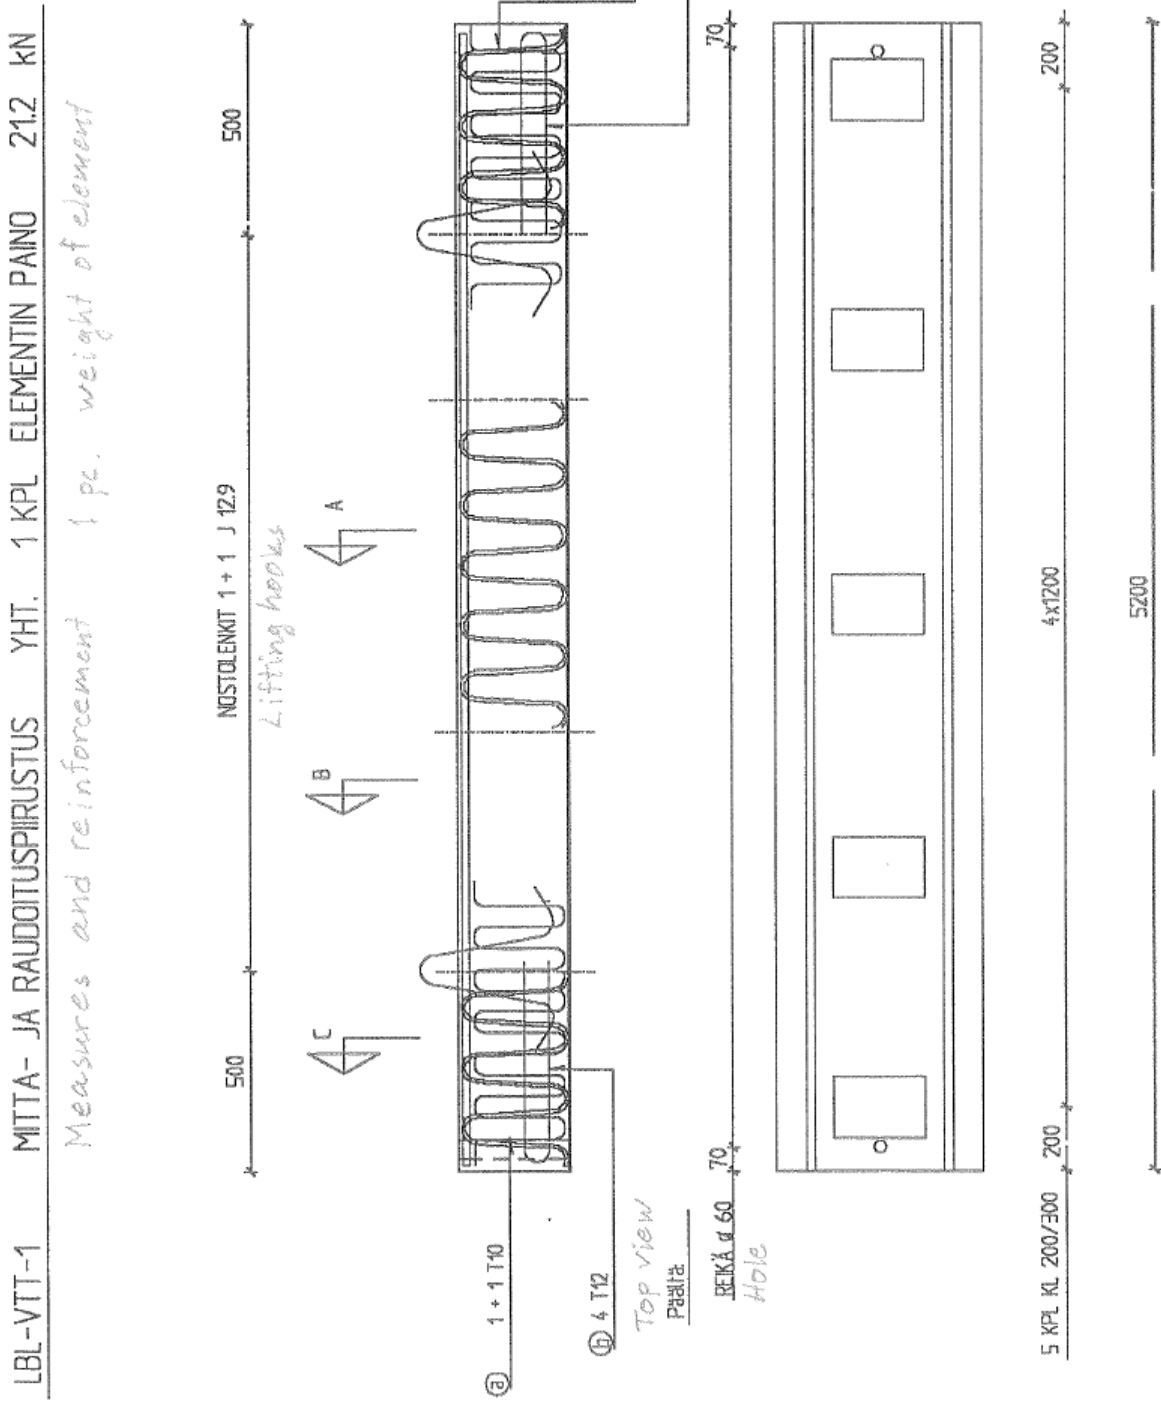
Steel component of LBL beam. Elevation (lattice girders) and plan (bottom plate). See Fig. 2 for sections A, B and C.
